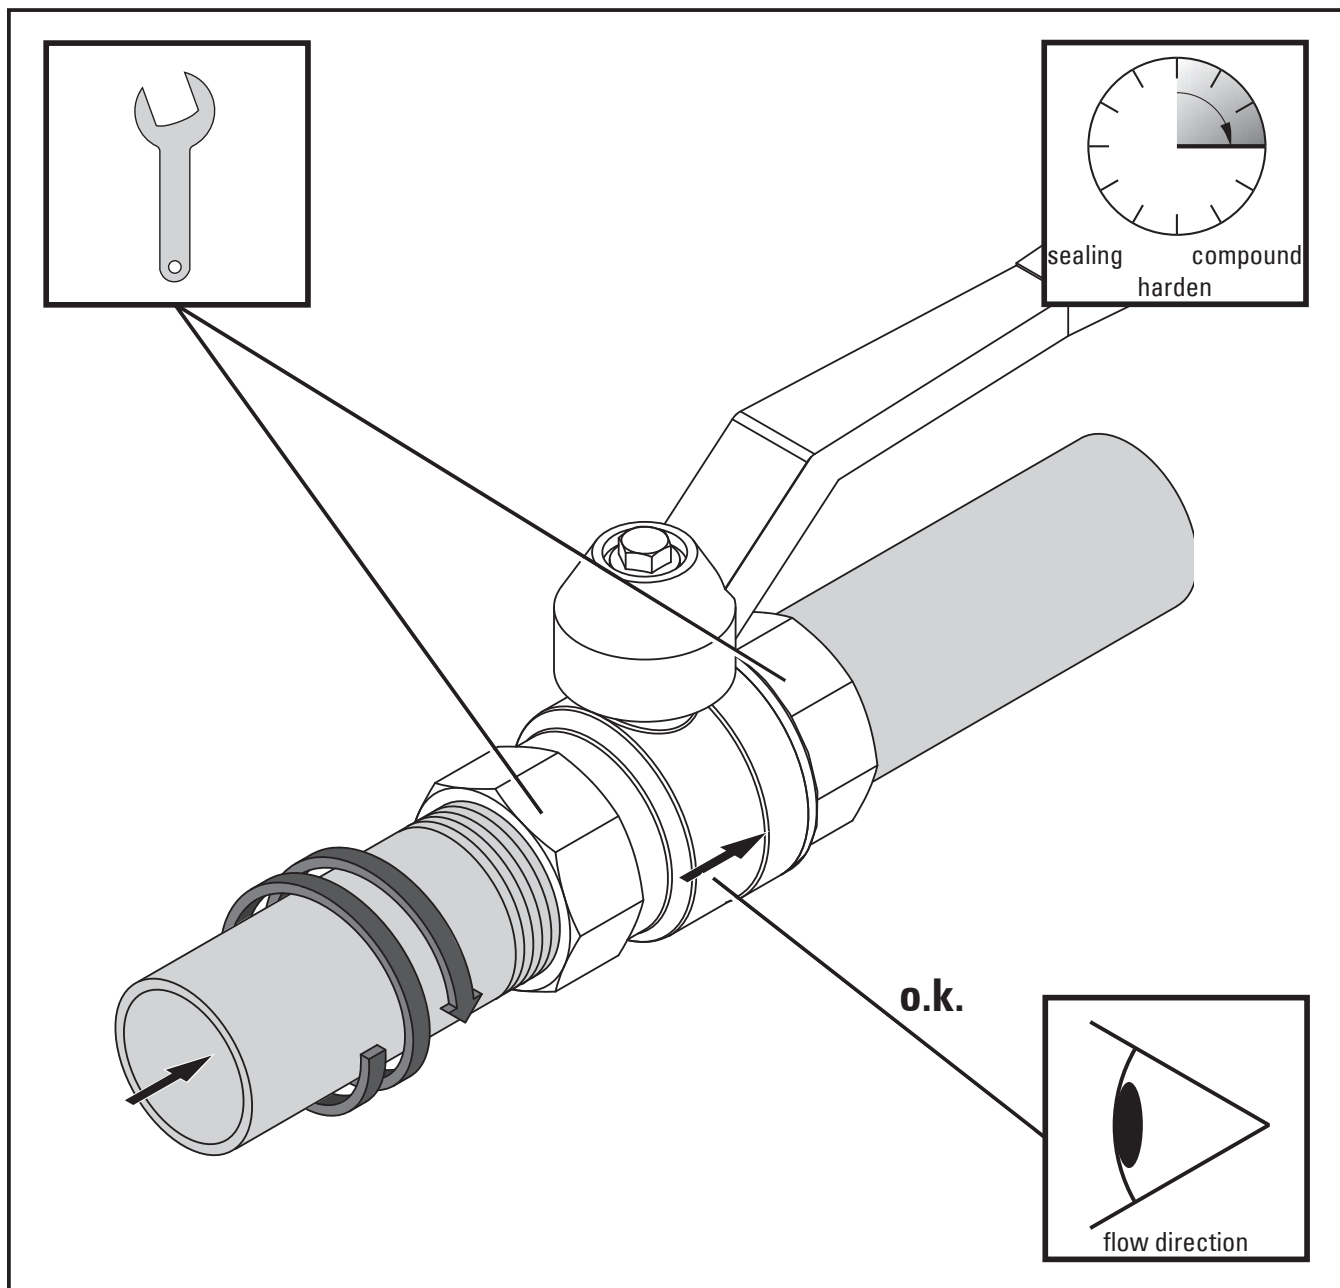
ball valves, mounting threaded connection (Fig.: Art. TB111025)
